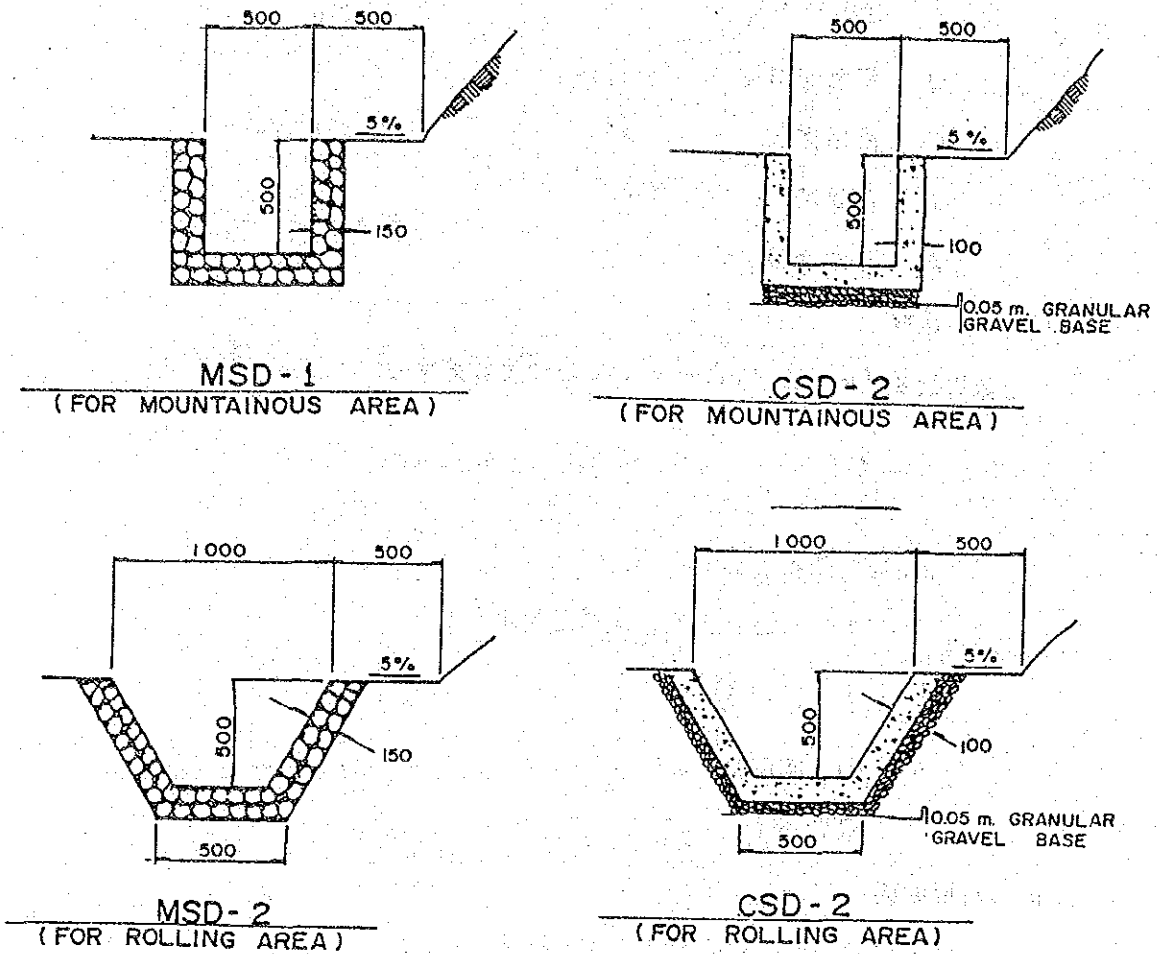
TYPICAL CROSS SECTION OF SIDE DITCH
